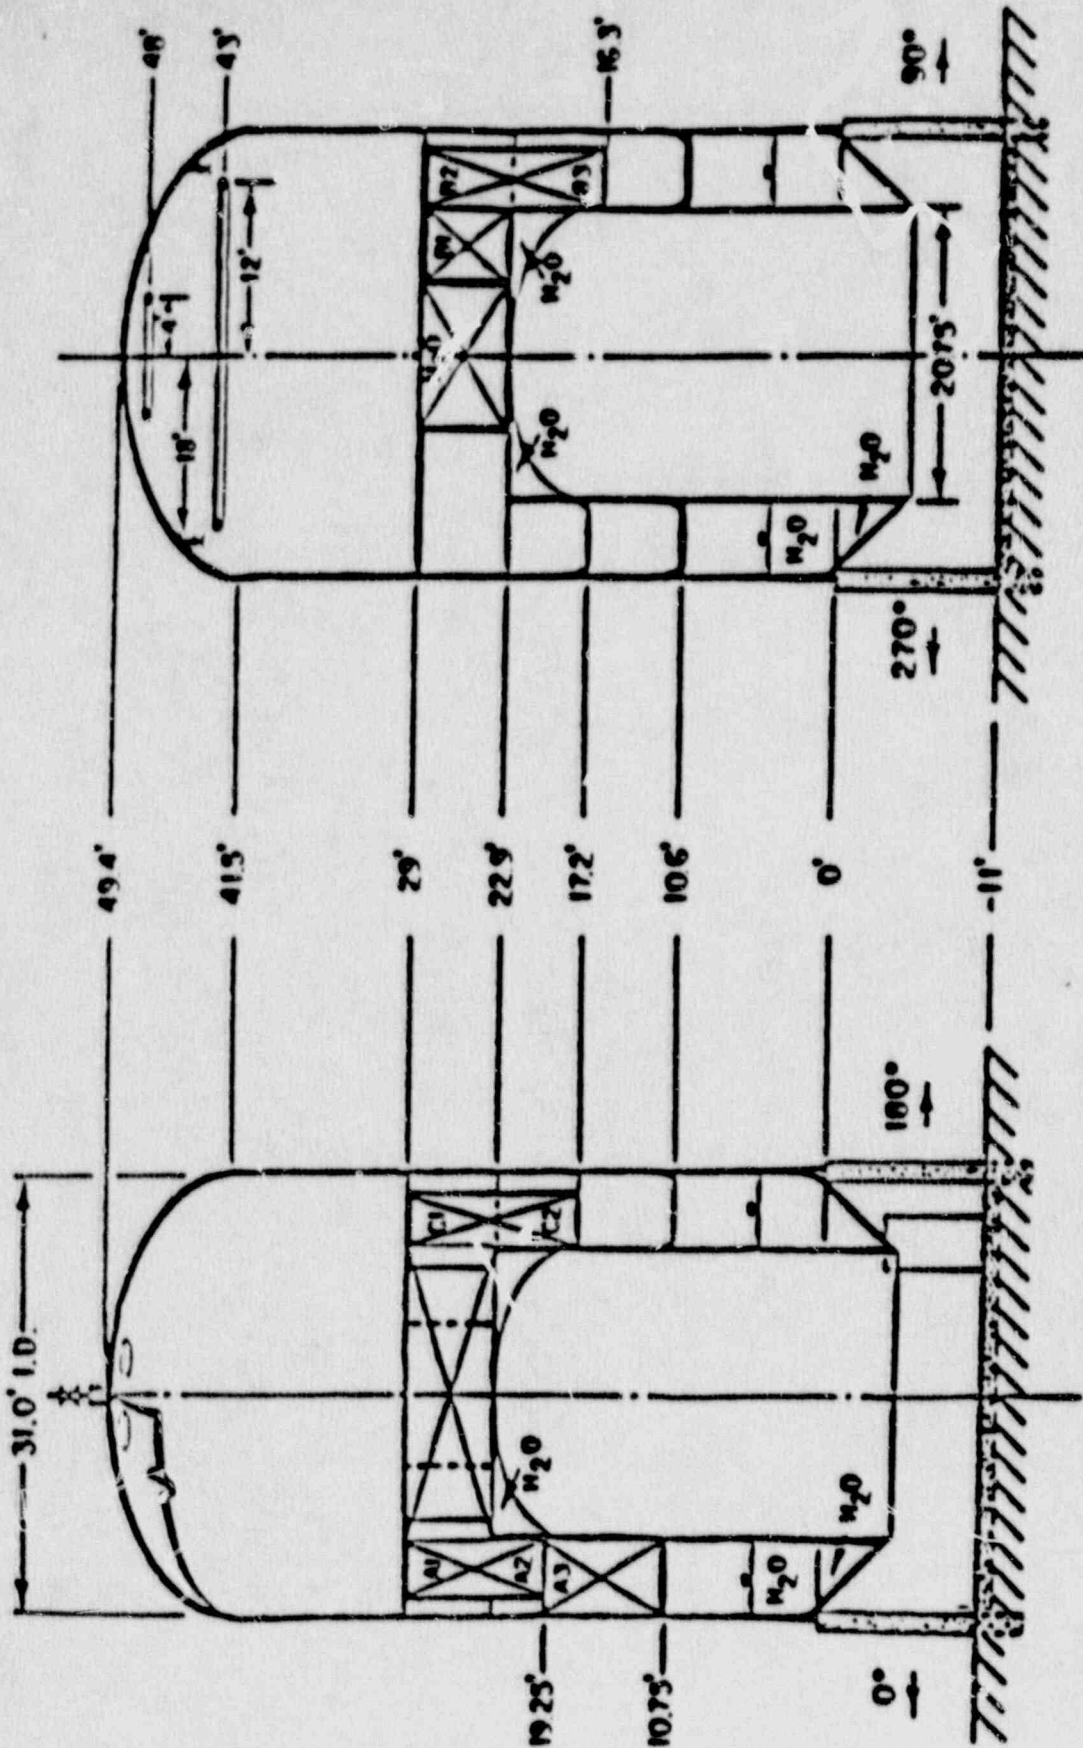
Elevation views of 1/4 quarter-scale test facility
